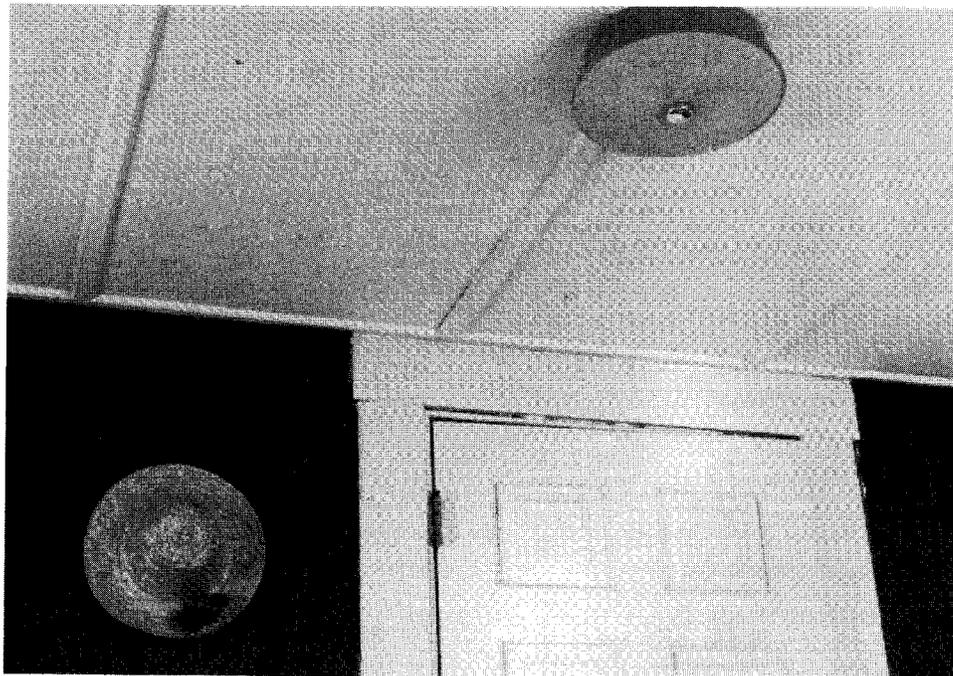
Room 204, trim of west closet doorway (may date to 1900 renovation).
